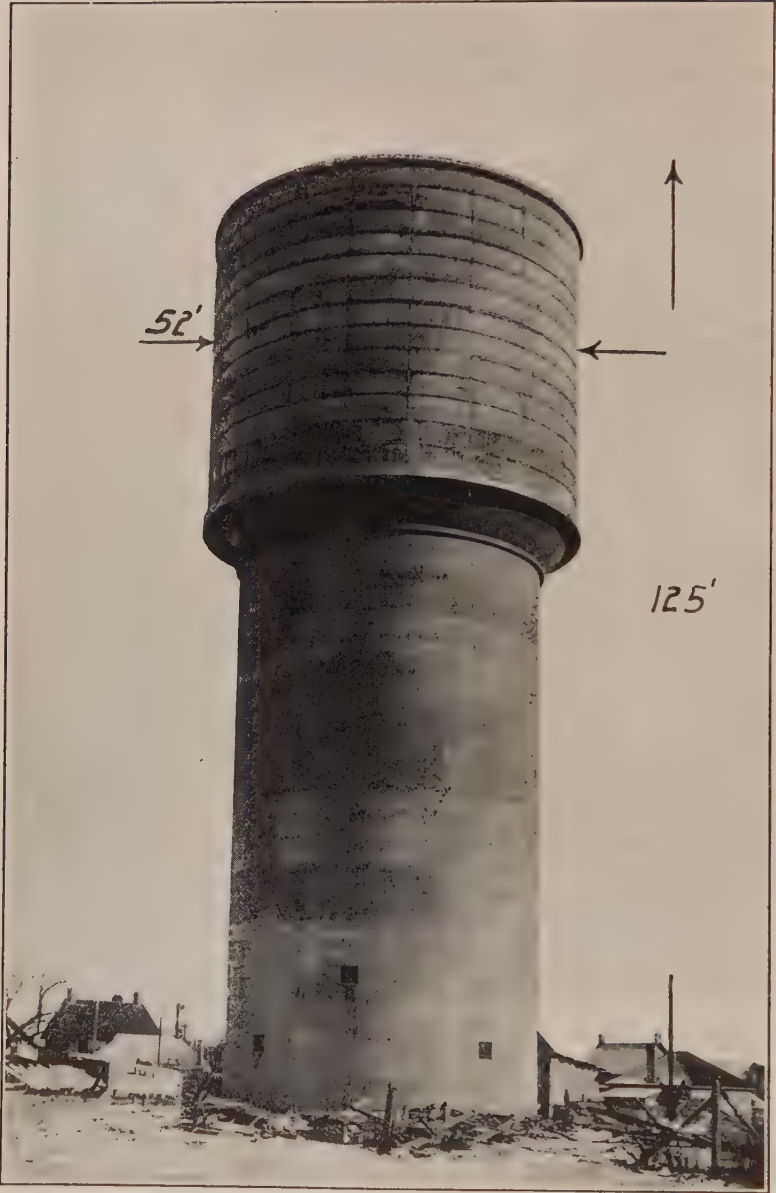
600,000-gal. Water Tank of Unwaterproofed Reinforced Concrete, Berlin, Canada.
